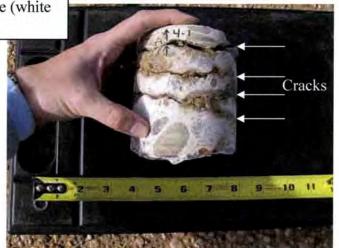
Core 4, Segment 1 - Cracking shows that concrete was likely placed in same lifts at top of wall.
